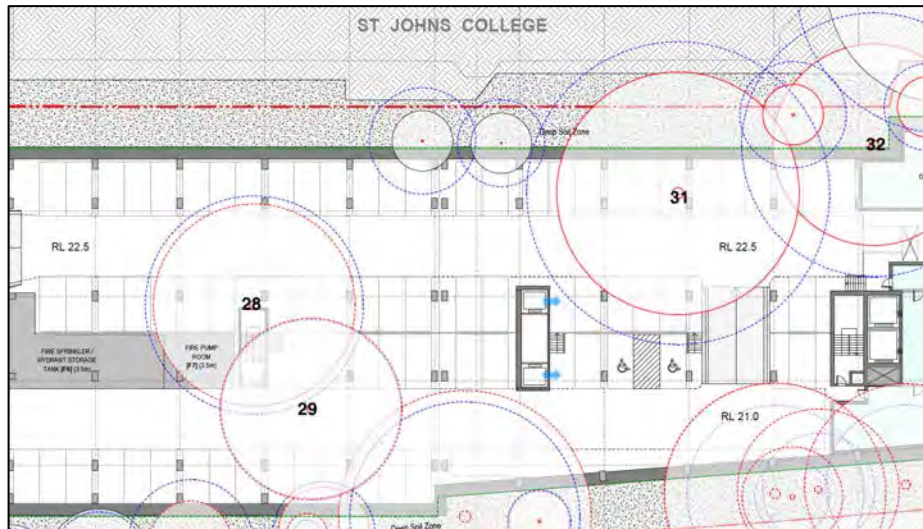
The tree impact plan showing the NRZ conflict of trees 28, 29, 31 & 32. (Source: Lower Ground plan from Preliminary Plans by architectus Rev T – TPZ Overlay, dated 16/05/2025).
